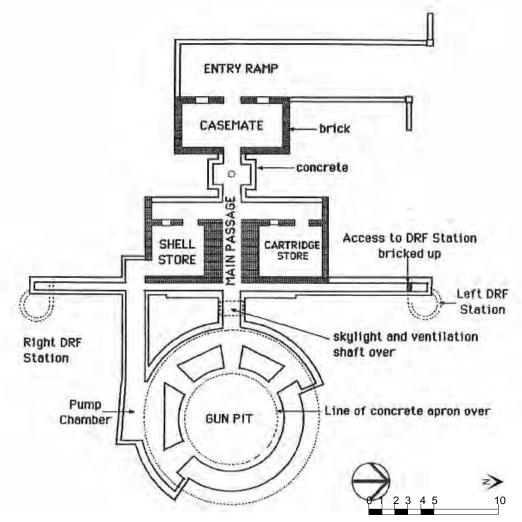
Plan for the Gun Emplacement showing built elements above ground (dotted lines) and below ground (solid lines). (Source: Shepherds Hill Cottage and Surrounds, Conservation Study, Gardner Browne, 1984)
